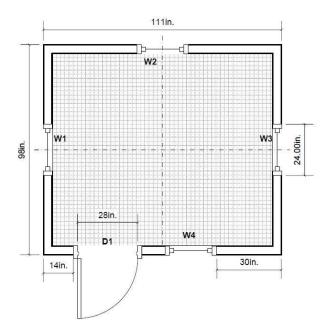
Floor Plan: Location of door and windows protected with Storm Stoppers panels on base structure
